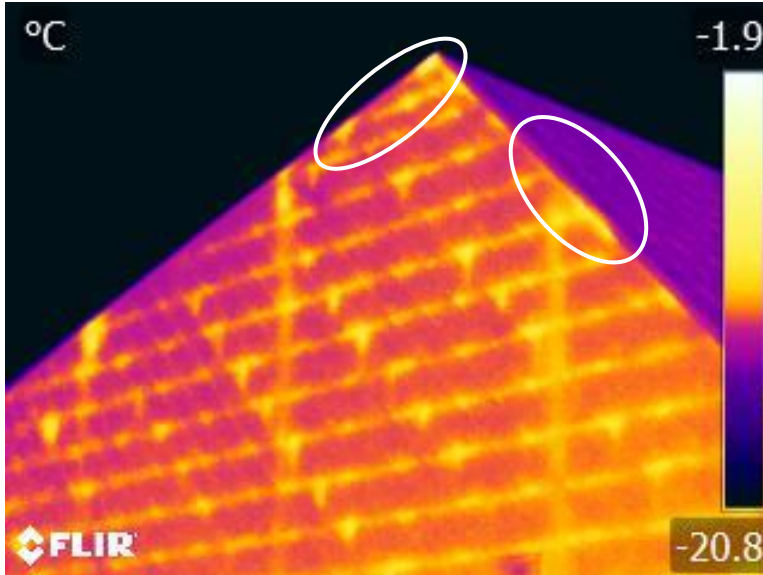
Detailed view of east gable wall showing thermal bridging at horizontal cladding supports as well as apparent air exfiltration at numerous cladding and fascia locations.
